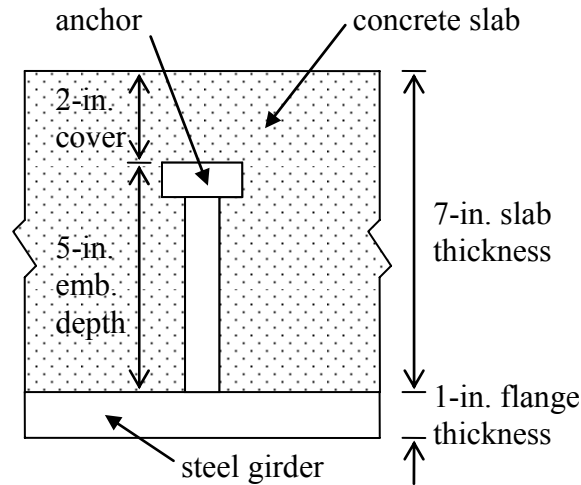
Idealized girder flange, concrete slab, and anchor dimensions
